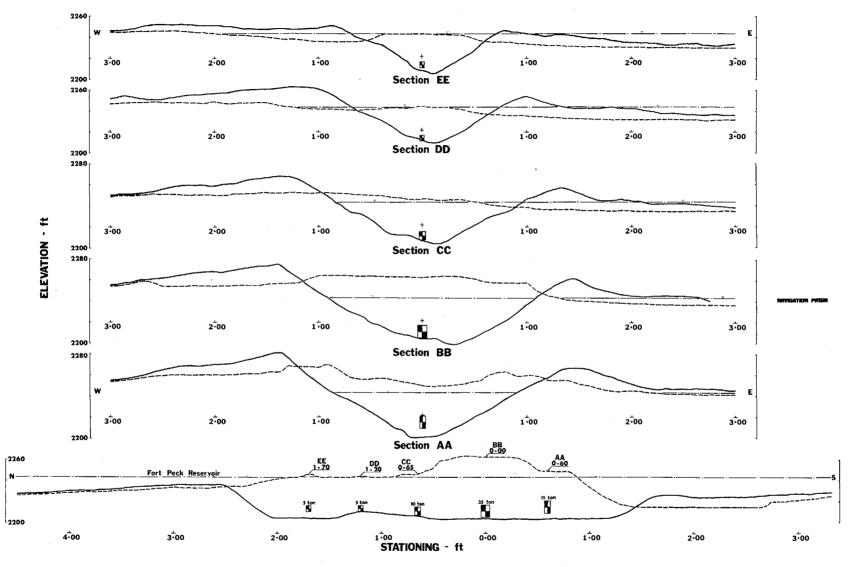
Centerline profile and cross sections, Reservoir connection experiment.
